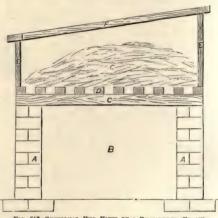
SECTIONAL END VIEW OF A CHAMBERED FRAME.
